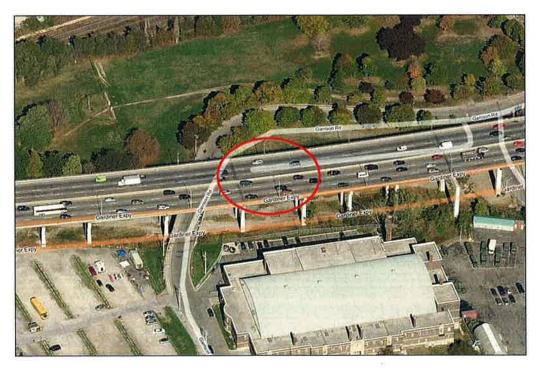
Aerial Overview of Structure (Bent 53-55) (fair condition – stained and unstained cracking, delaminations, isolated spalls, patches, wet areas and light scaling)
